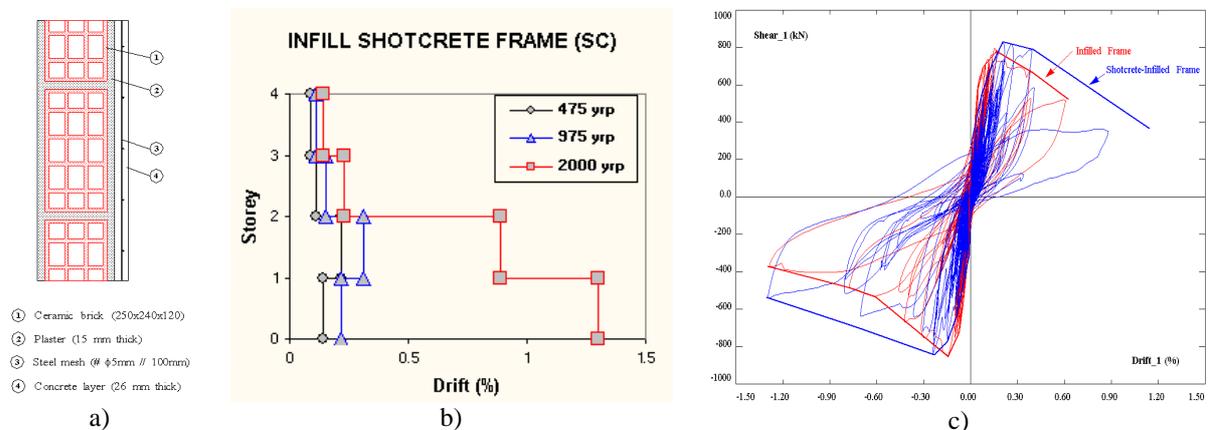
Shotcrete of the infill walls: a) Constructive details (layout); b) Drift profiles; c) 1st storey shear-drift diagrams for the infilled and infilled-shotcrete tests and corresponding envelope curves
